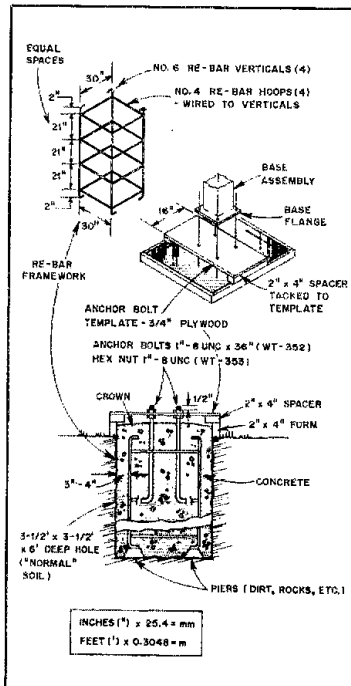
Plans for installing concrete base for Wilson ST-77B. Although the instructions and dimensions will vary from one tower to the next, this is representative of the type of concrete base specified by most manufacturers.
